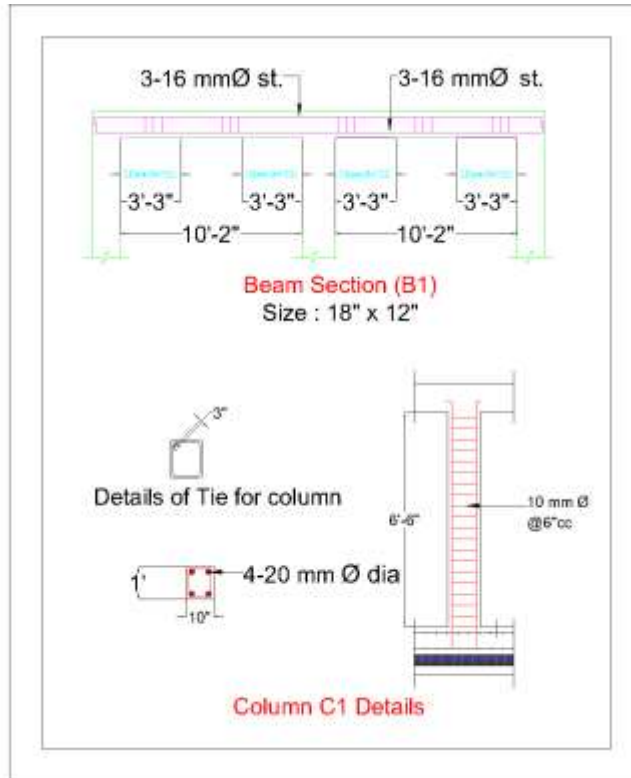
Beam and column sections for large Institution -scale tank for 75 households
